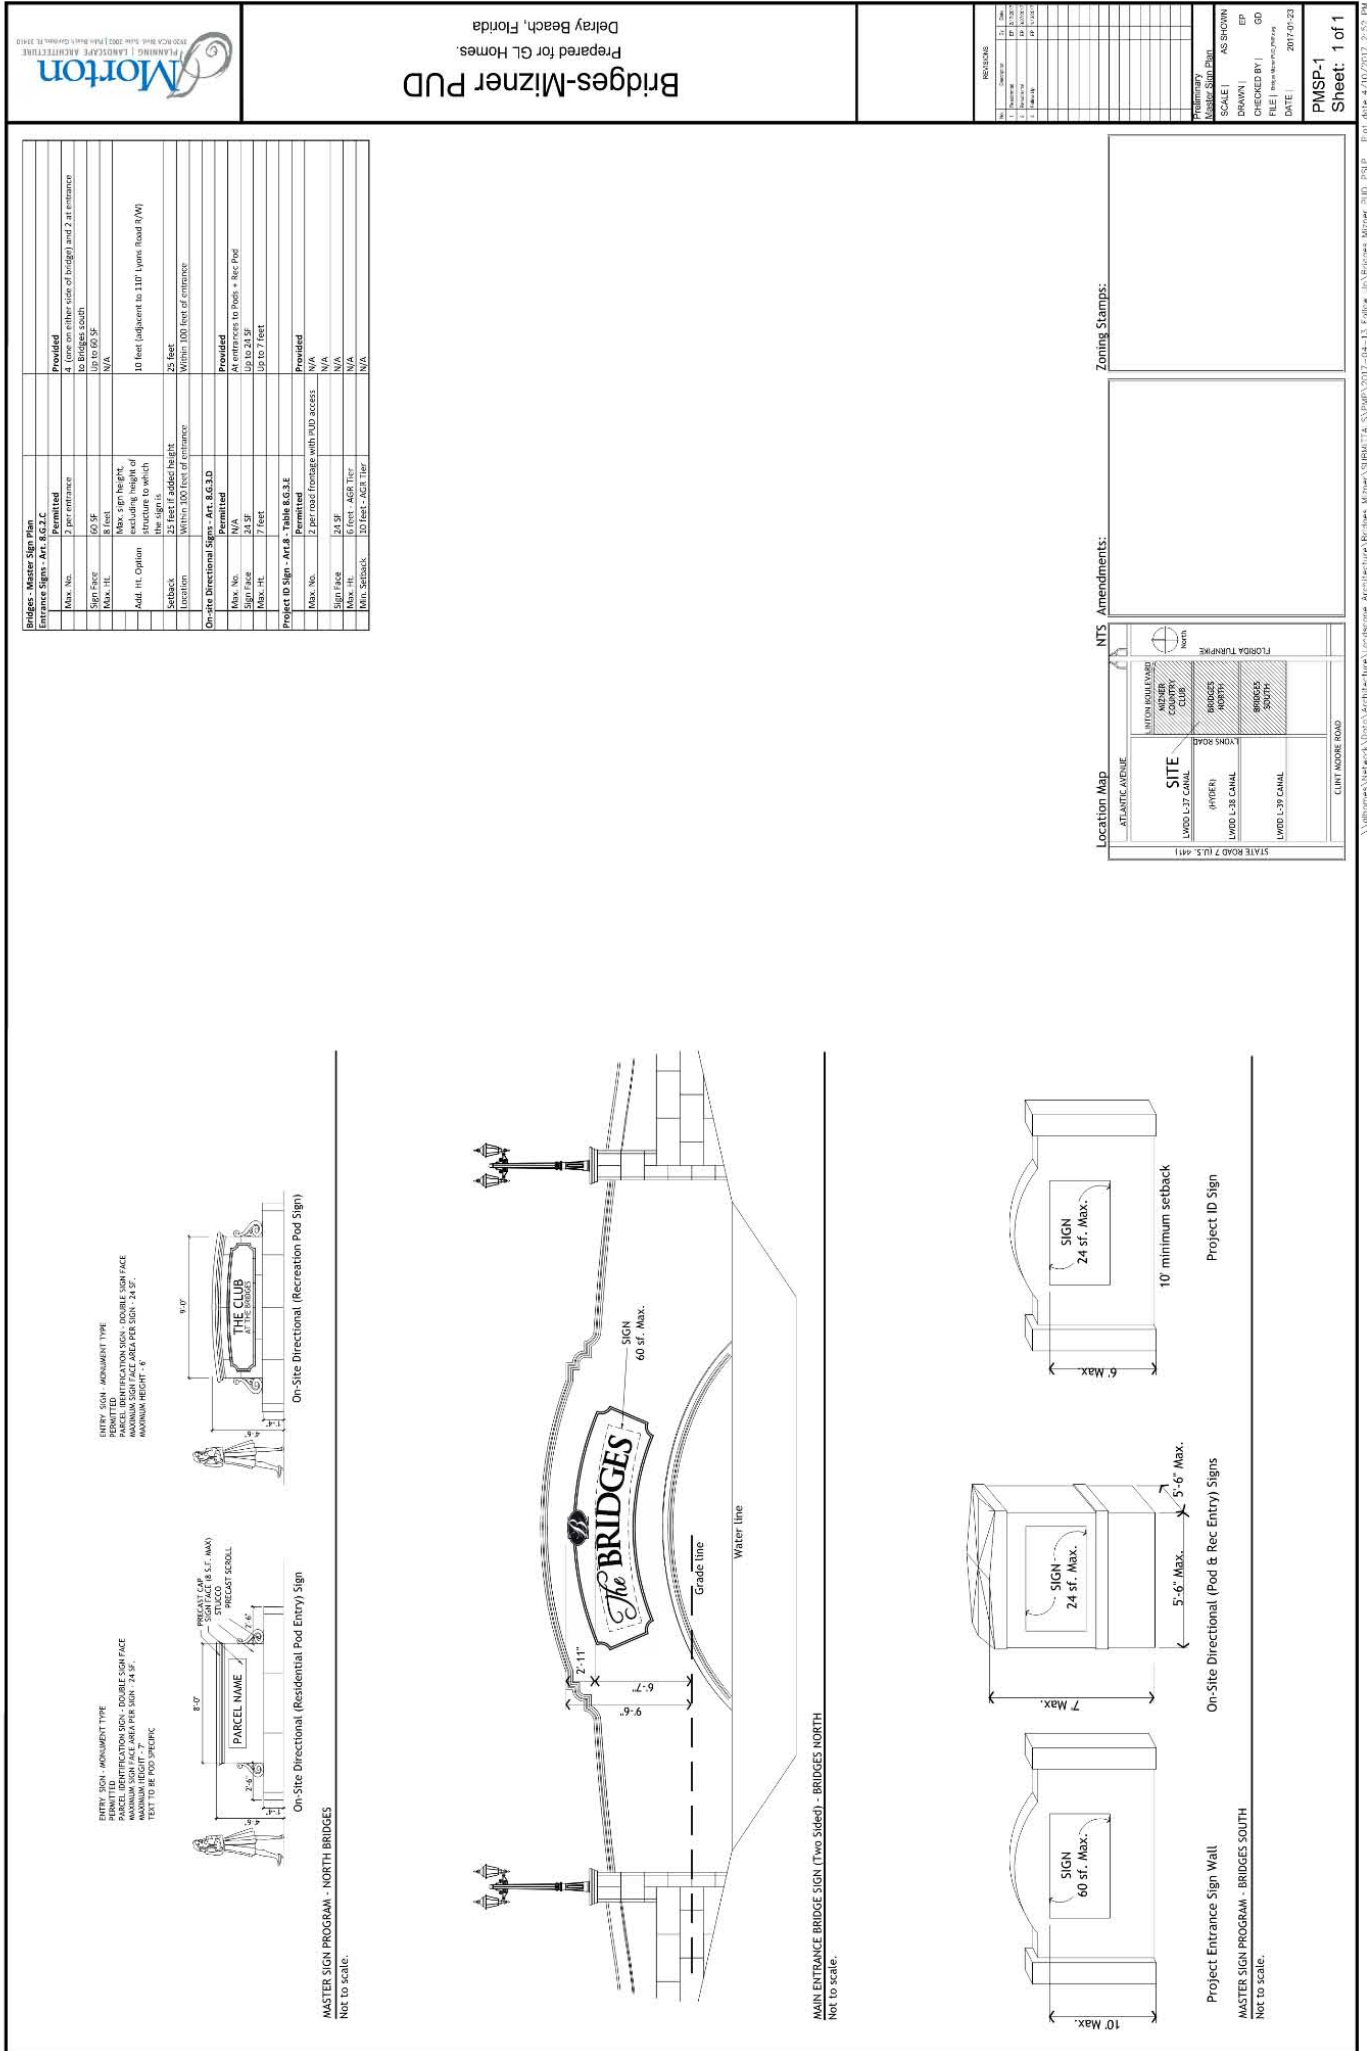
Preliminary Master Sign Plan dated April 13, 2017
